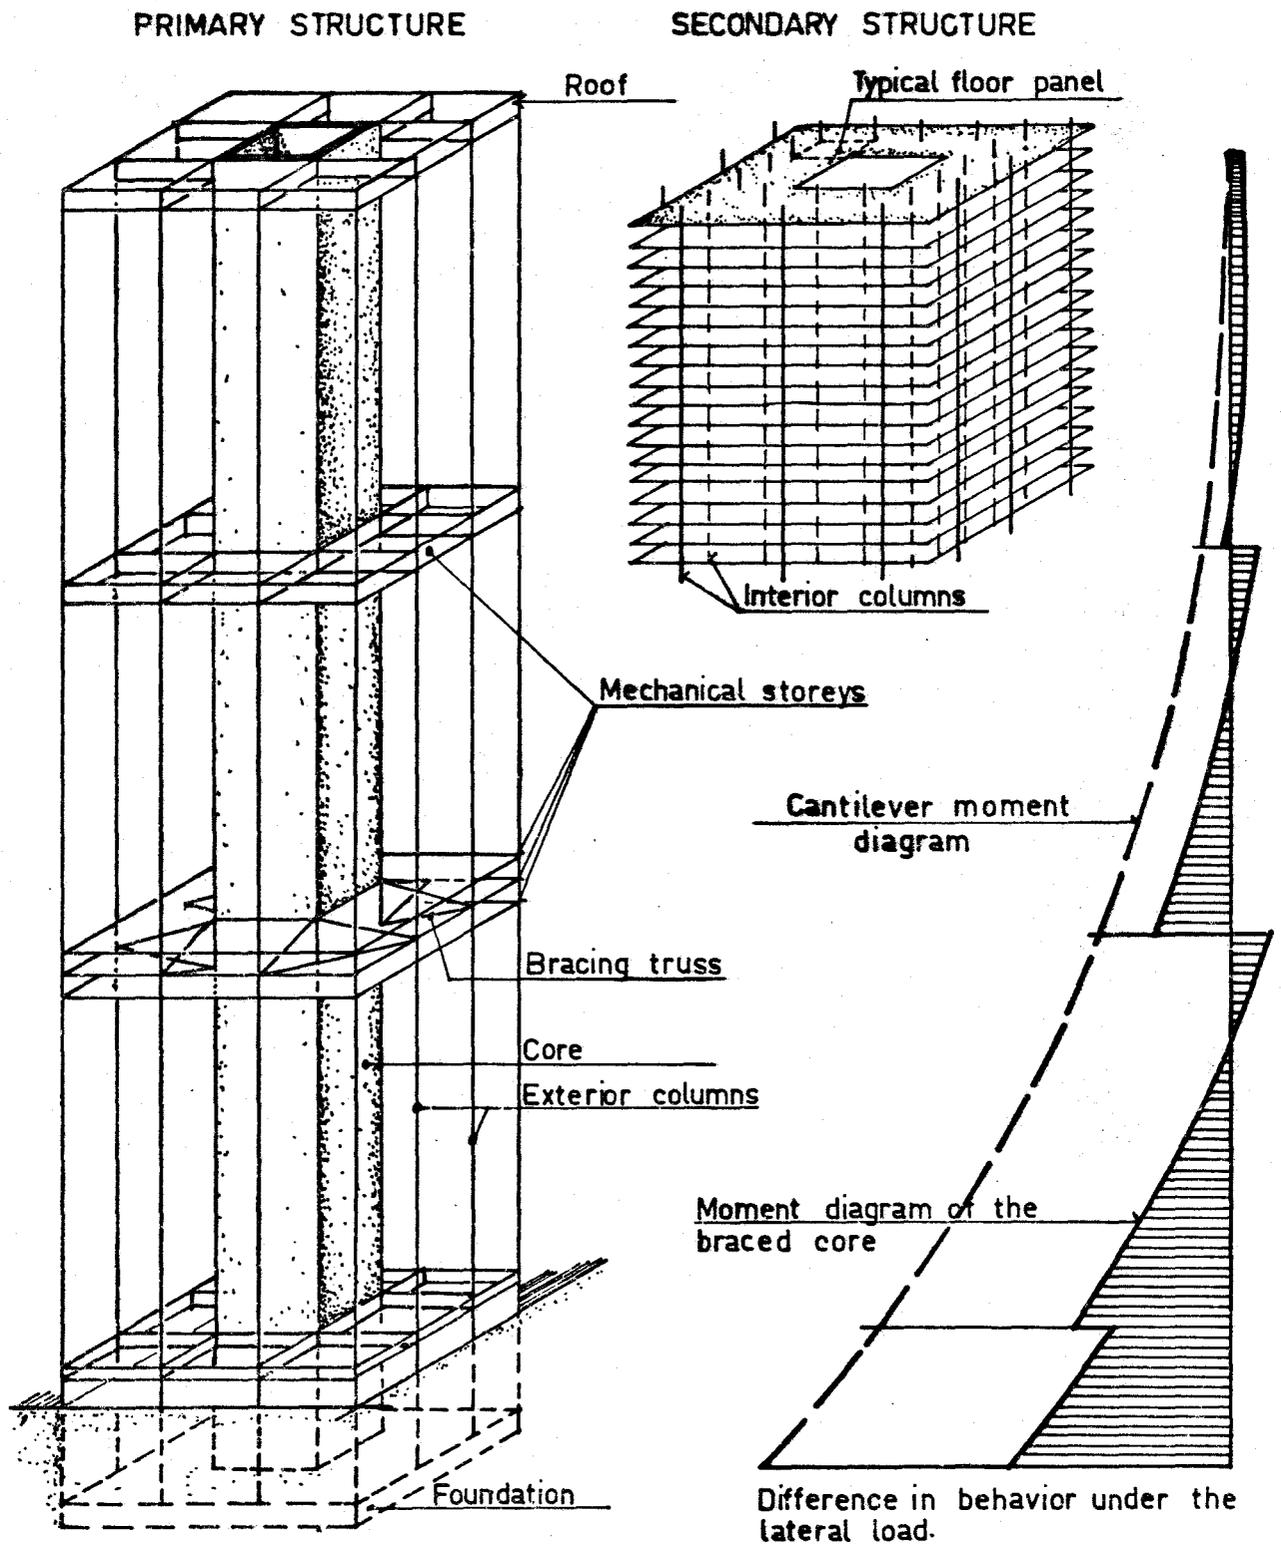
CO-ORDINATION MODEL OF INTERIOR TRUSS TYPE OF BUILDING
